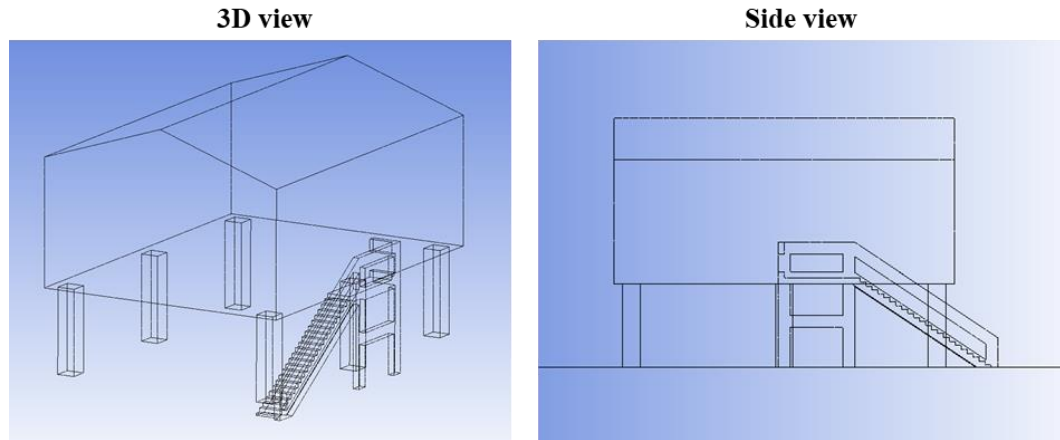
Gable roof house drawing elevated by 2.1 m with stairs
